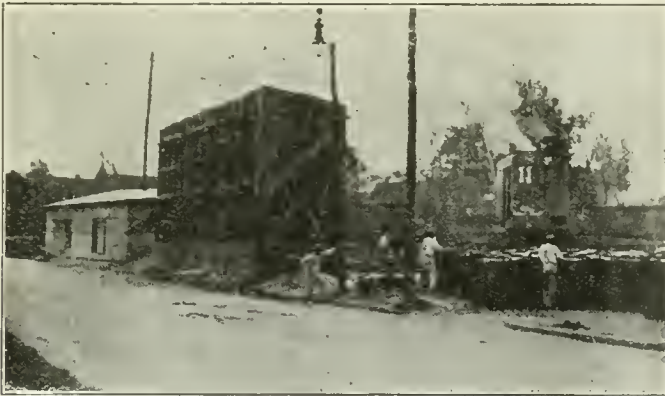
CENTRAL PROPORTIONING PLANT ON CONCRETE ROAD CONSTRUCTION BETWEEN HIGH POINT AND WINSTON-SALEM, N. C.
